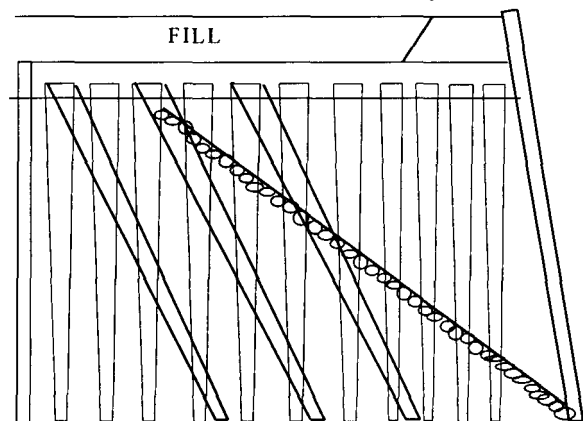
Timber Pile Relieving Platform, East River Drive, New York, NY
